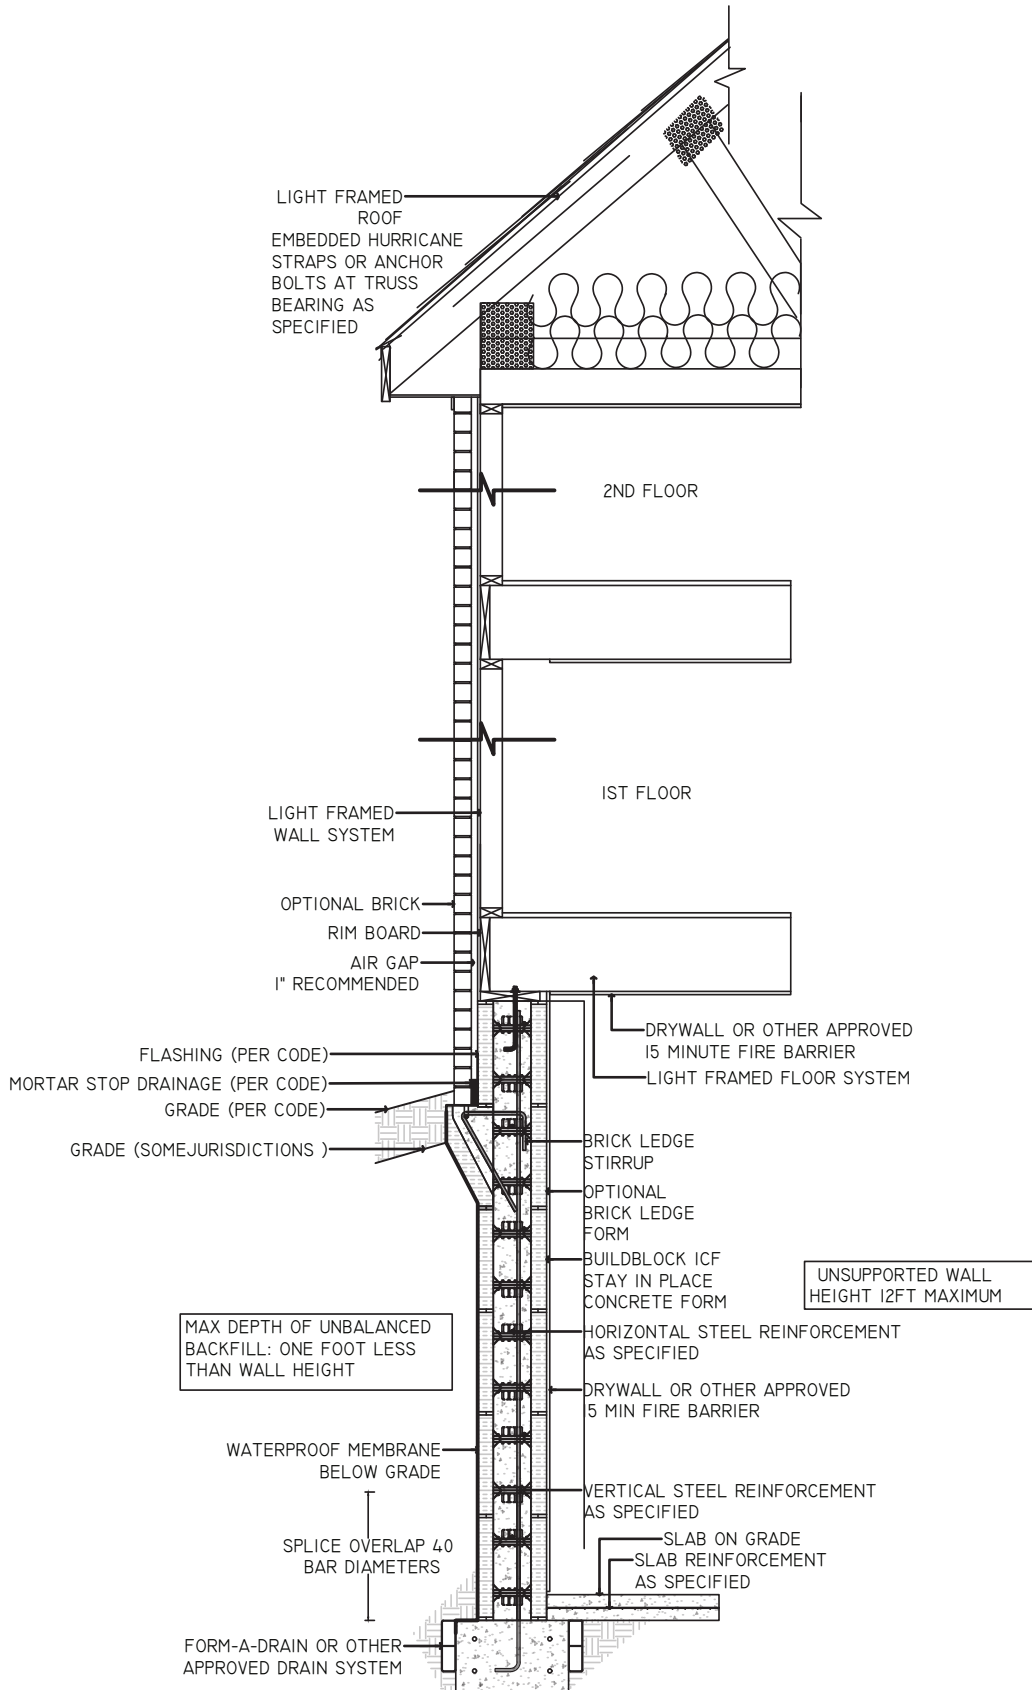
LOAD CASE 2. SECTION CUT THROUGH FLAT WALL OR VERTICAL CORE OF SCREEN GRID WALL. SUPPORTING 2 STORIES OF LIGHT FRAMED WALL.
